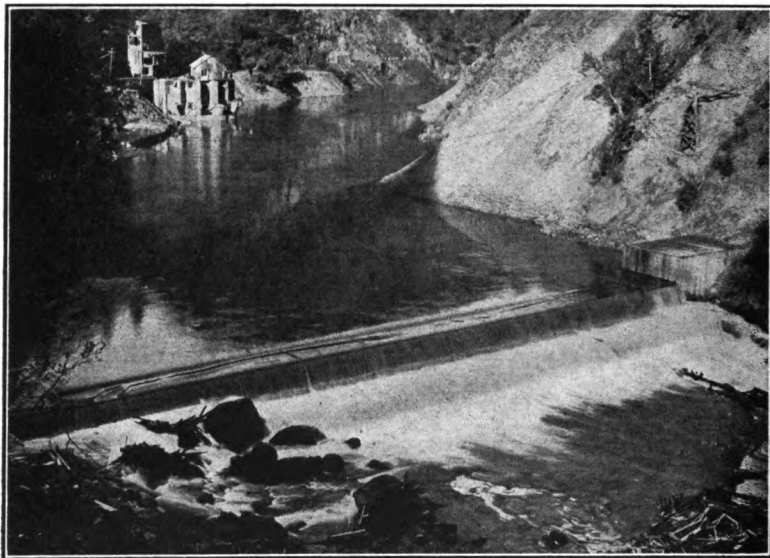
TEMPORARY TIMBER DAM AND INTAKE TOWER.
